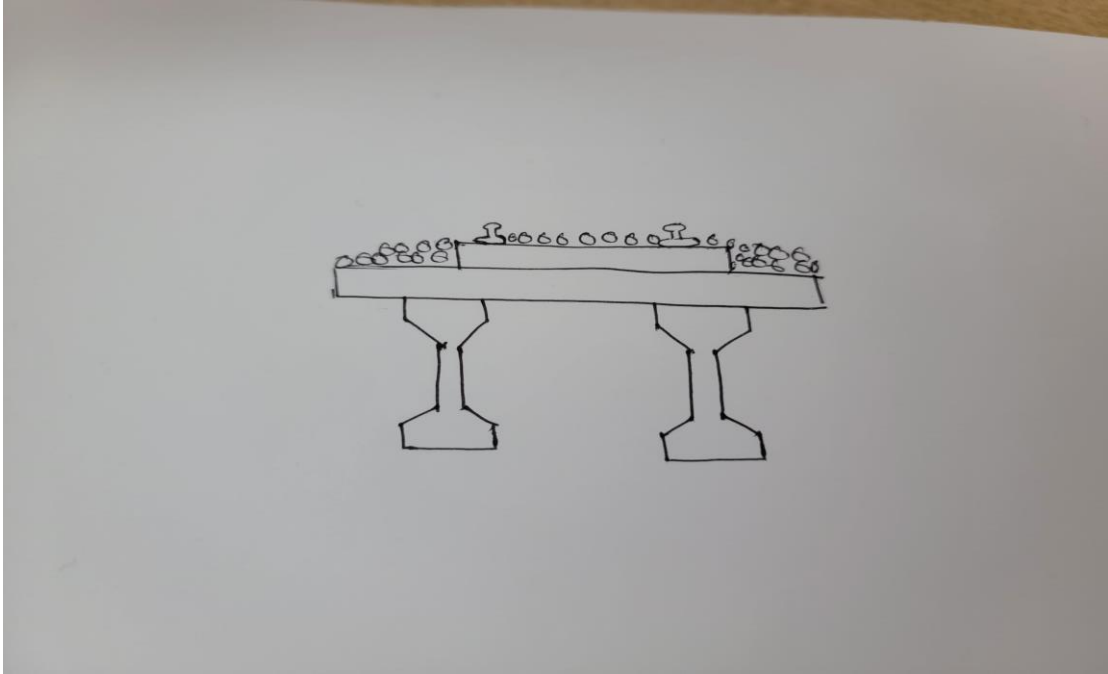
Traditional ballasted track, wooden sleeper with prefab concrete girder and cast in place deck
